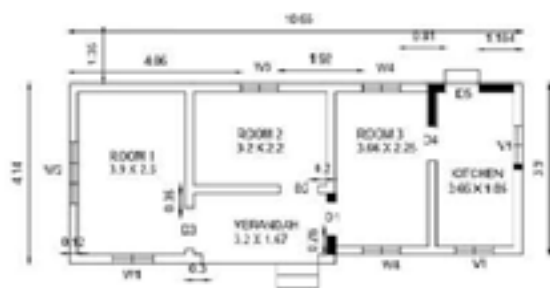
Plan of the building that was retrofitted (darkened walls were damaged in flood)
